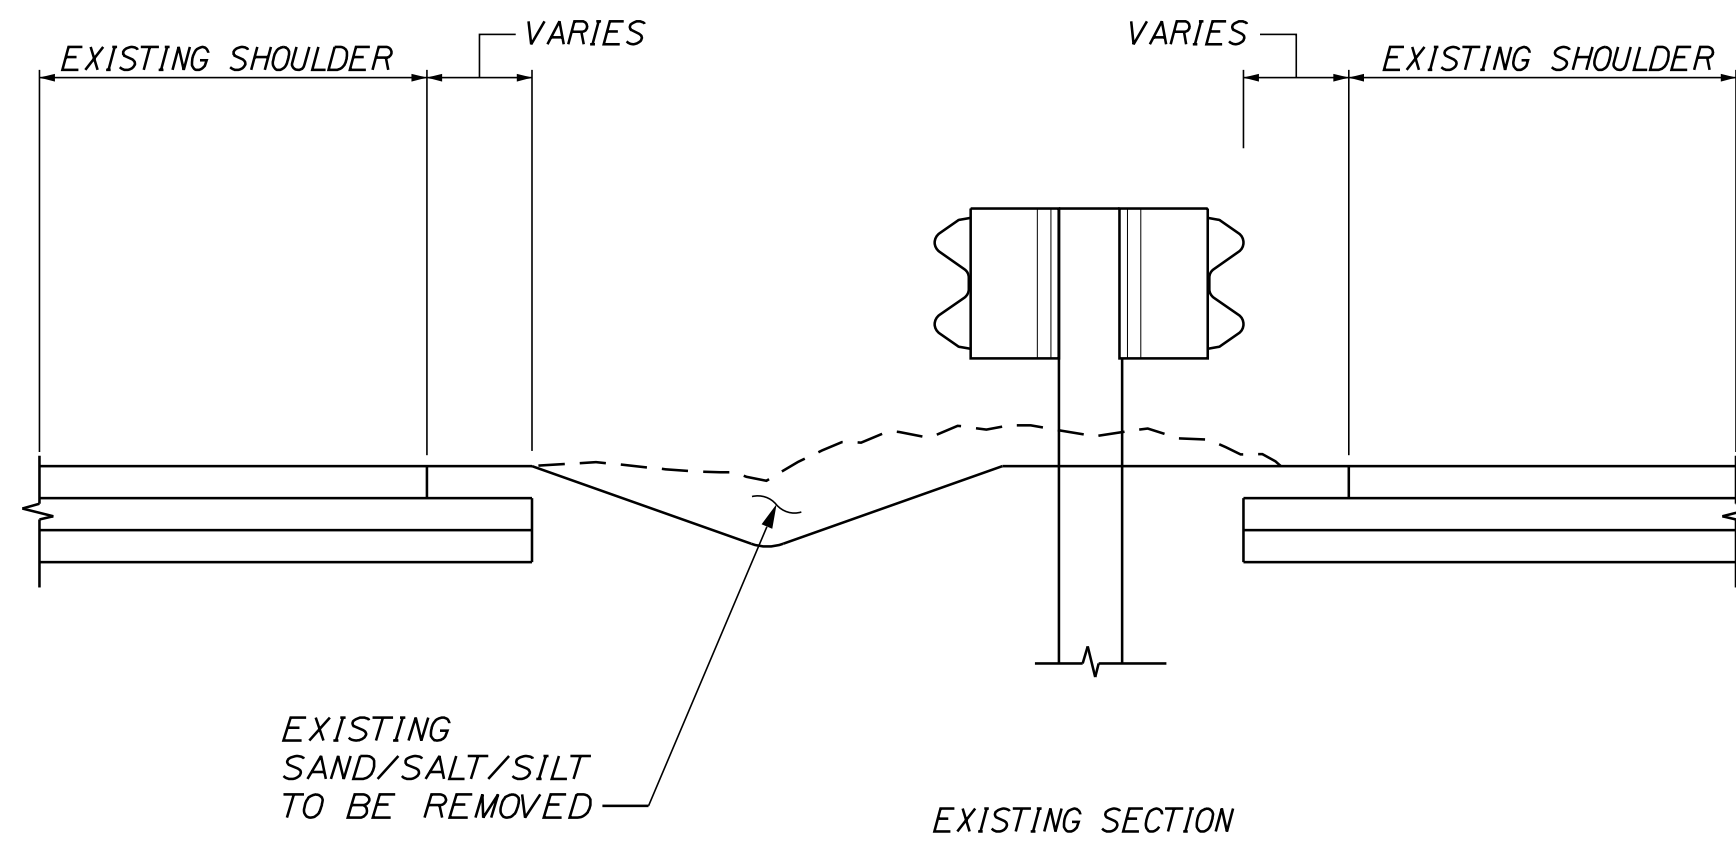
DETAIL A BERM DROPOFF CORRECTION WITH GUARDRAIL
